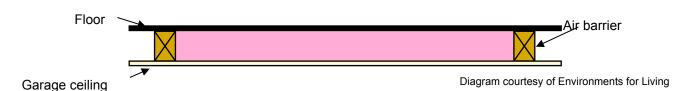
Alignment of insulation and air barrier at garage ceiling
